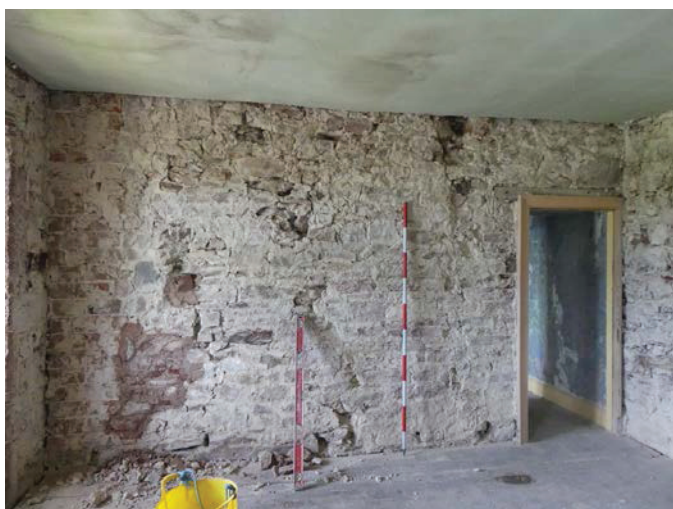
(left): The north-east elevation, Room F7, viewed from the south-west
